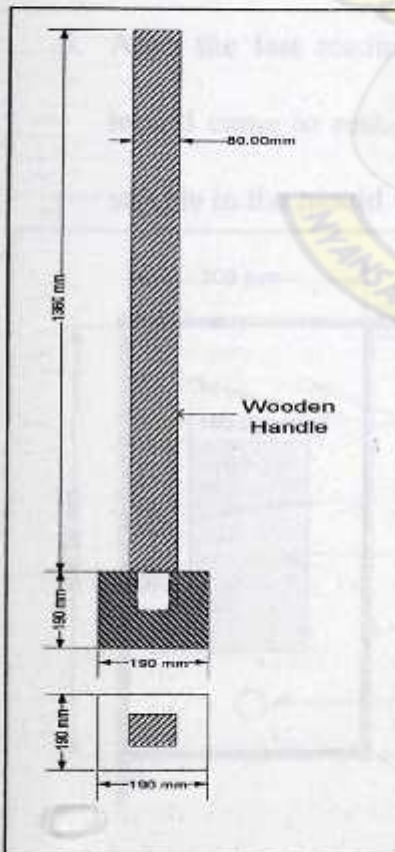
Wooden Rammer Used for the Model Compaction in Section and Plan
